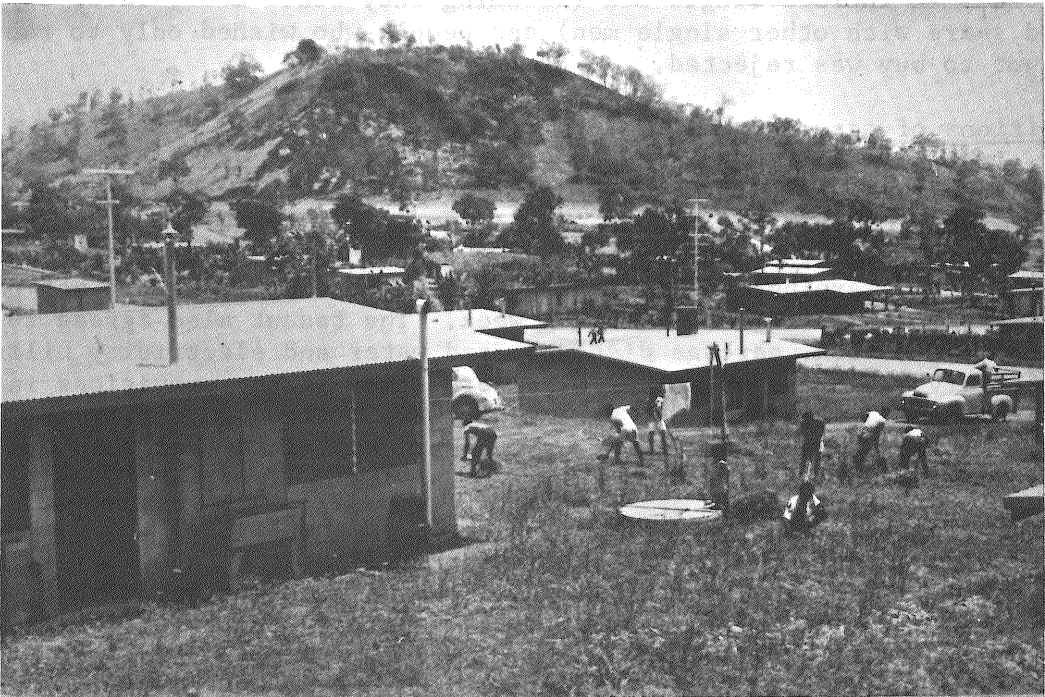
Latest design concrete houses, independent units 'with amenities'.
